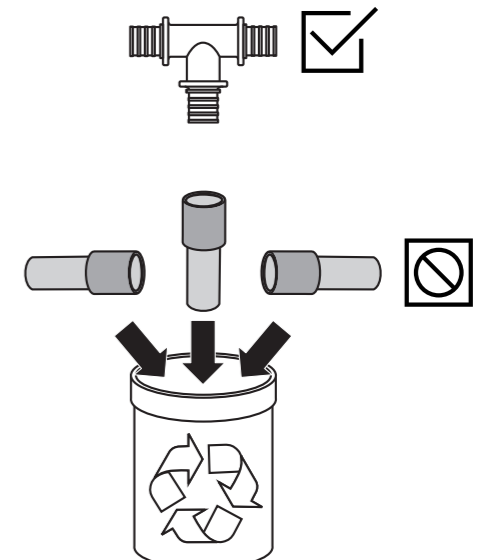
Dispose of the compression sleeves with the detached pipe sections
